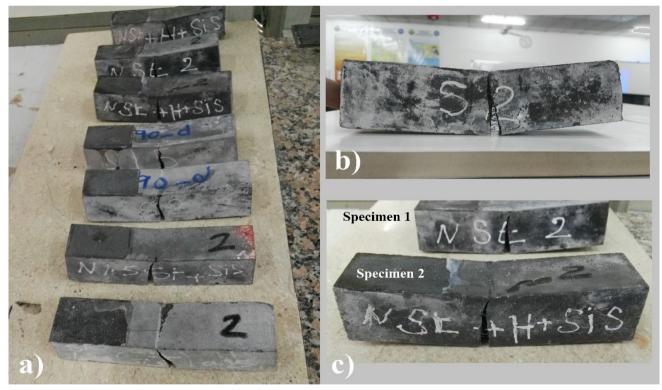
Failure mode after bending tests; (a) Some tested specimens of RPC; (b) The specimen of mix MS; (c) The specimen 1 of mix MNS, the specimen 2 of mix MNH3
